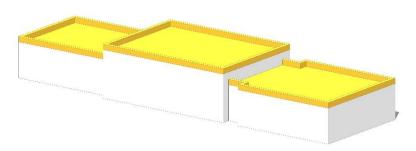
Outlot/Liner Commercial Building Type Roof
